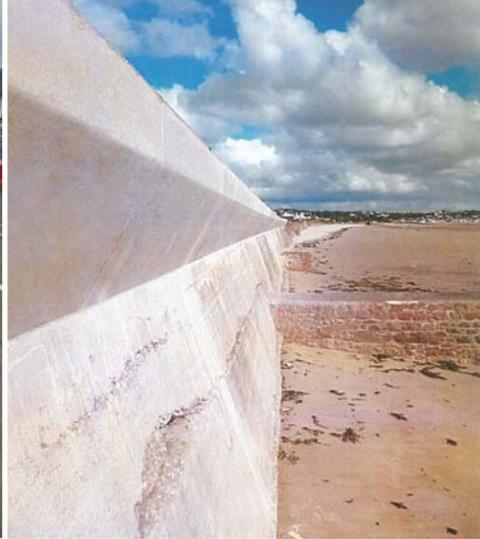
Outer surface of new concrete and wall awaiting repairs.
